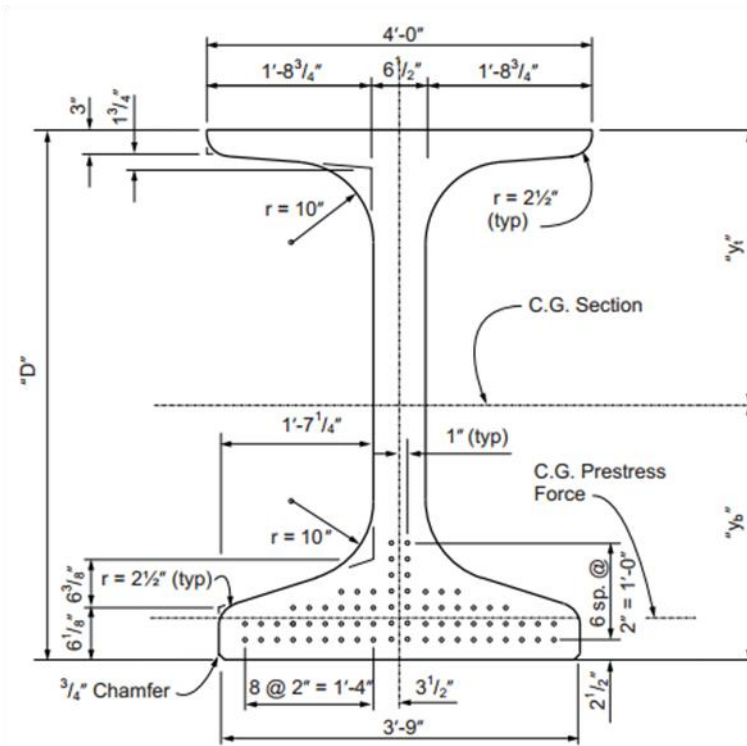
Pretensioned Wide Flange Girder (WF)⁵
